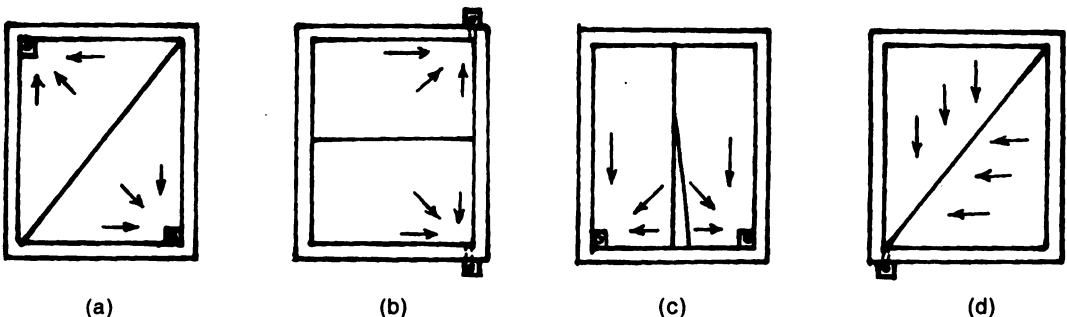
Drainage of roof: various slope arrangements and positions of rainwater pipes for roof drainage.
